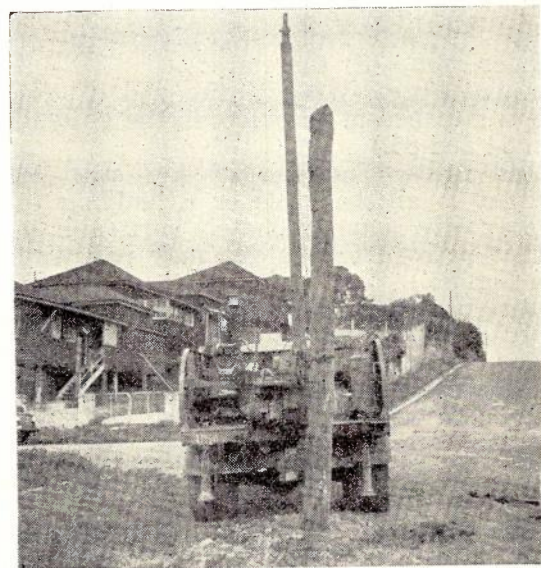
Pole Lowered Into Hole Ready for Filling In.
